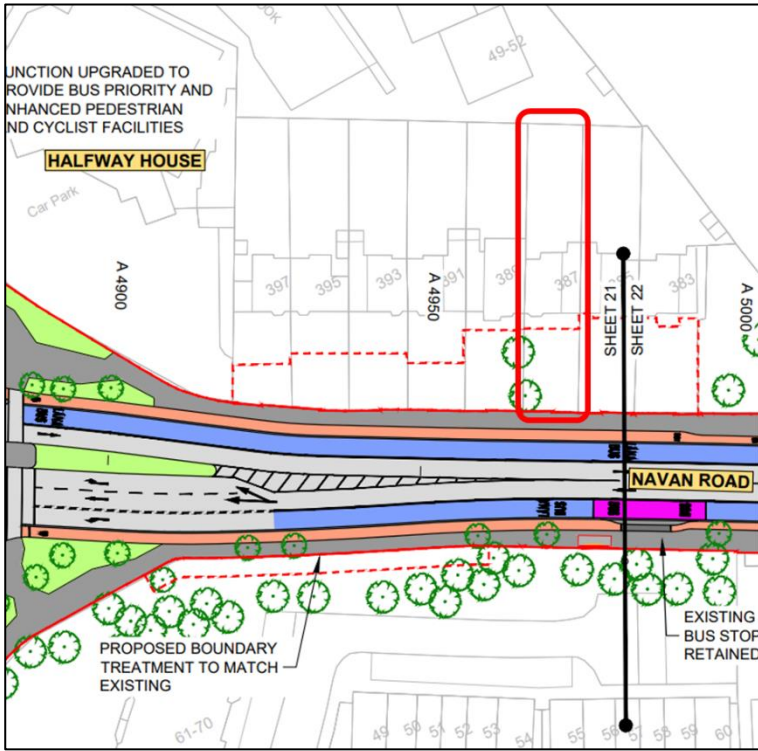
Proposed new Layout at 387 Navan Road
